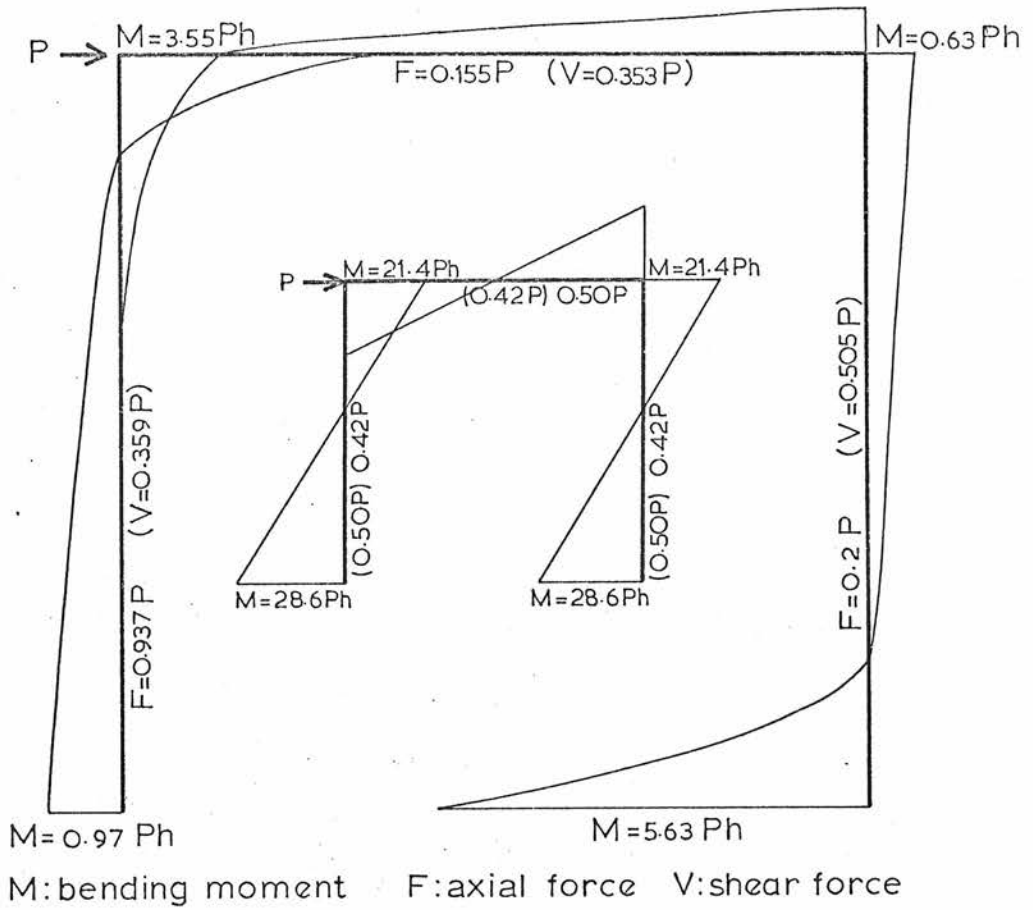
Typical bare & infilled frame forces (WS2)
